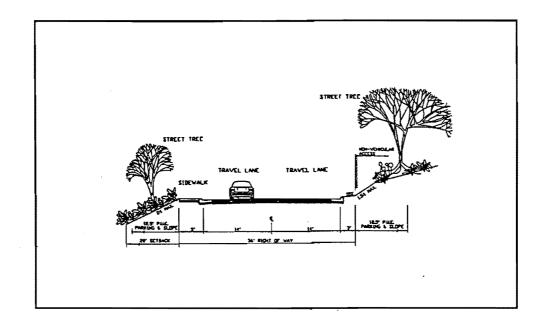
UPLAND TWO WAY - 38' R.O.W. - PARKING ON DOWNHILL SIDE
